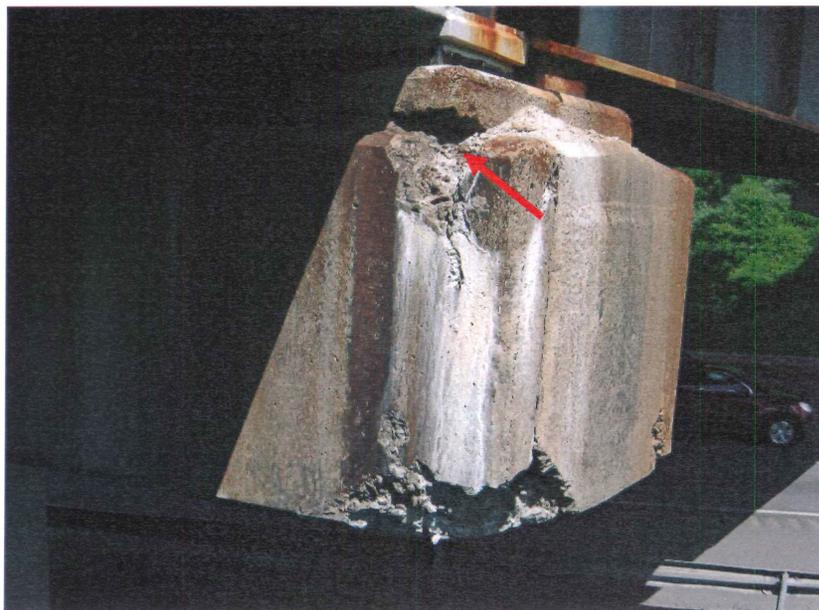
South face of Pier 7 at the east end. Note the spalls and undermining of the pedestal.
